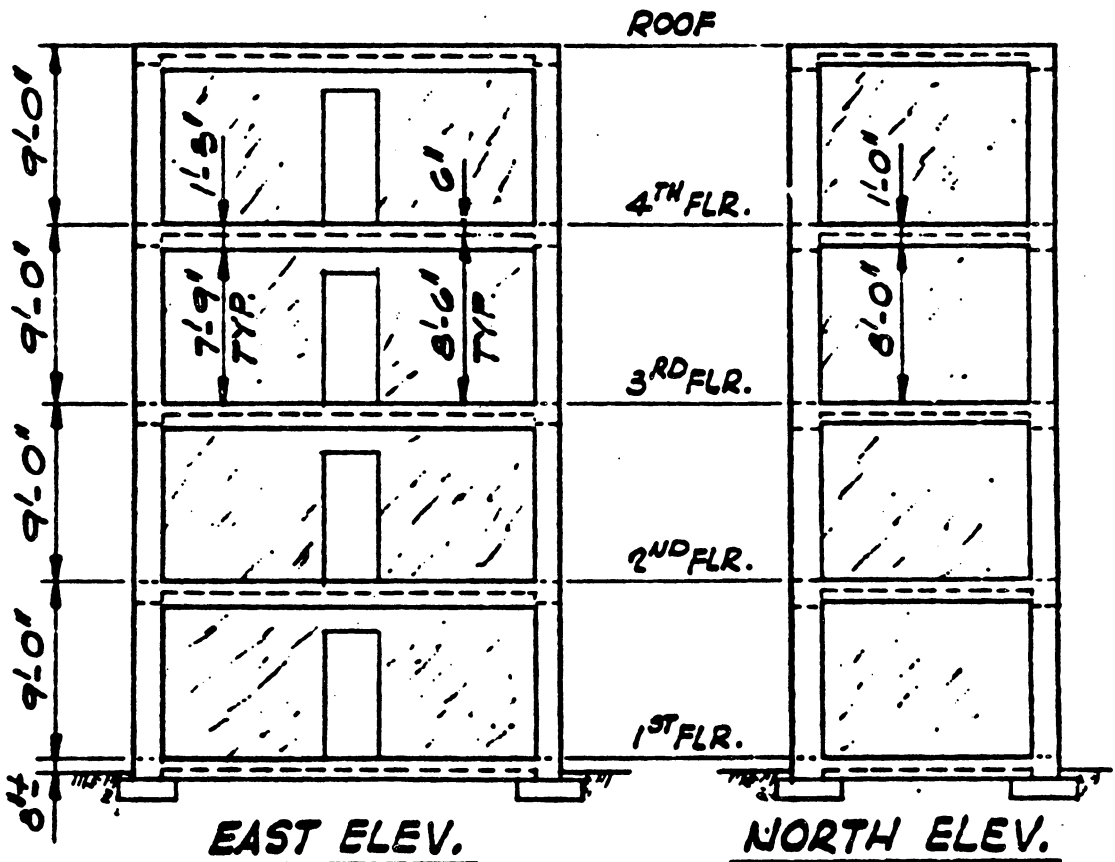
NORTH STRUCTURE WITH GYPSUM WALLBOARD PARTITIONS [Ref. No. 29].
